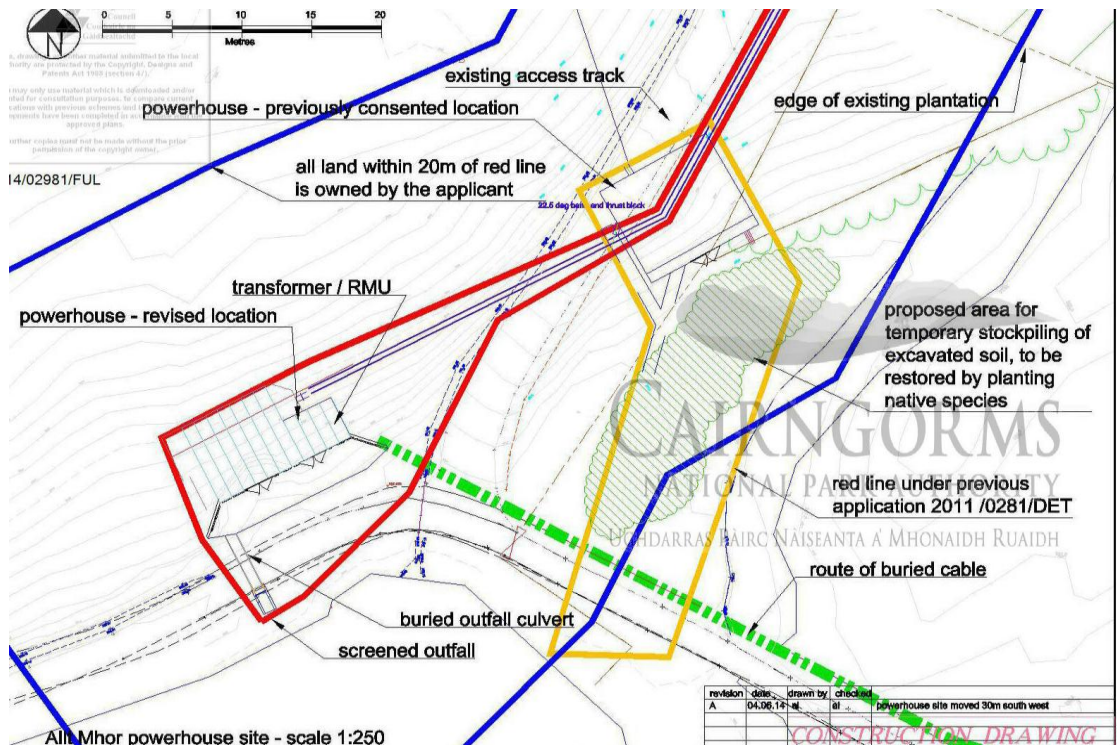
Site Layout- For illustrative purposes only (extract from drawing no. 854/111A)
